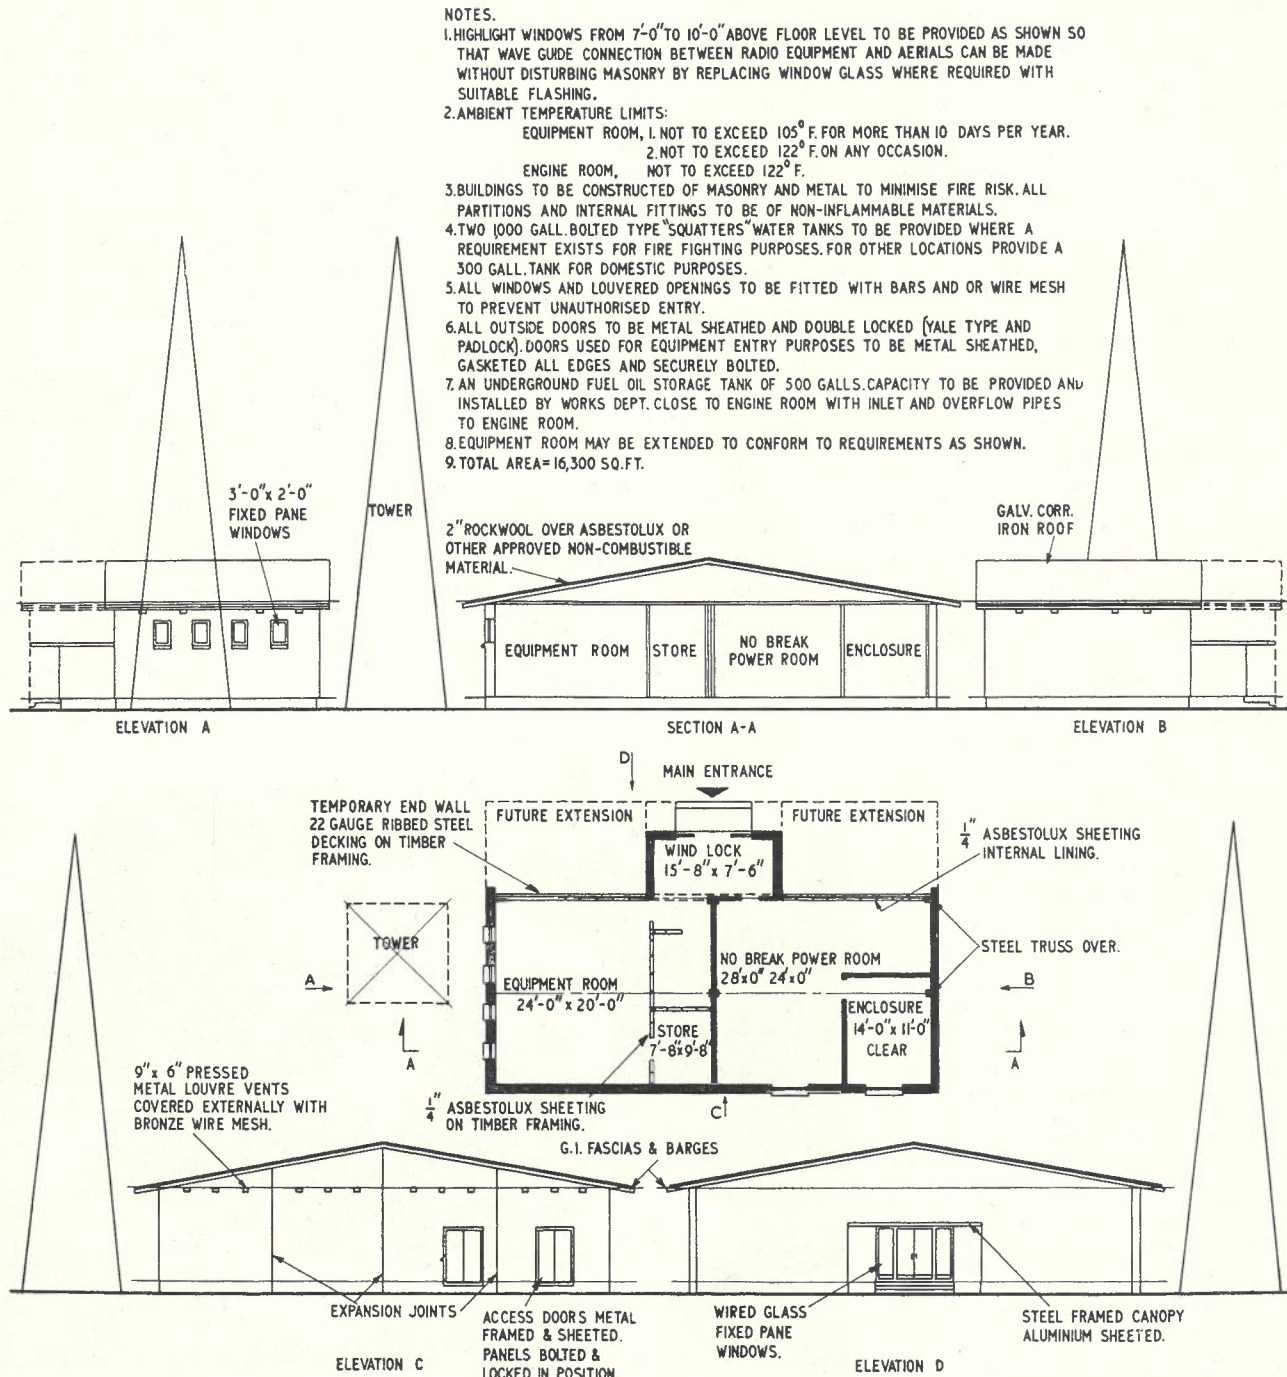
Layout of Typical Radio Repeater Building for Unattended Operation. Minor alterations to the site layout are made to cater for special site characteristics.
